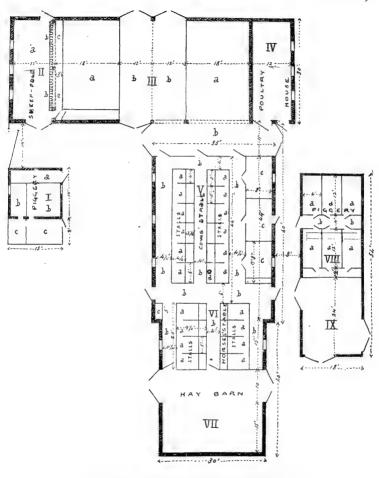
Levac farm.—Horizontal plan of the farm buildings
